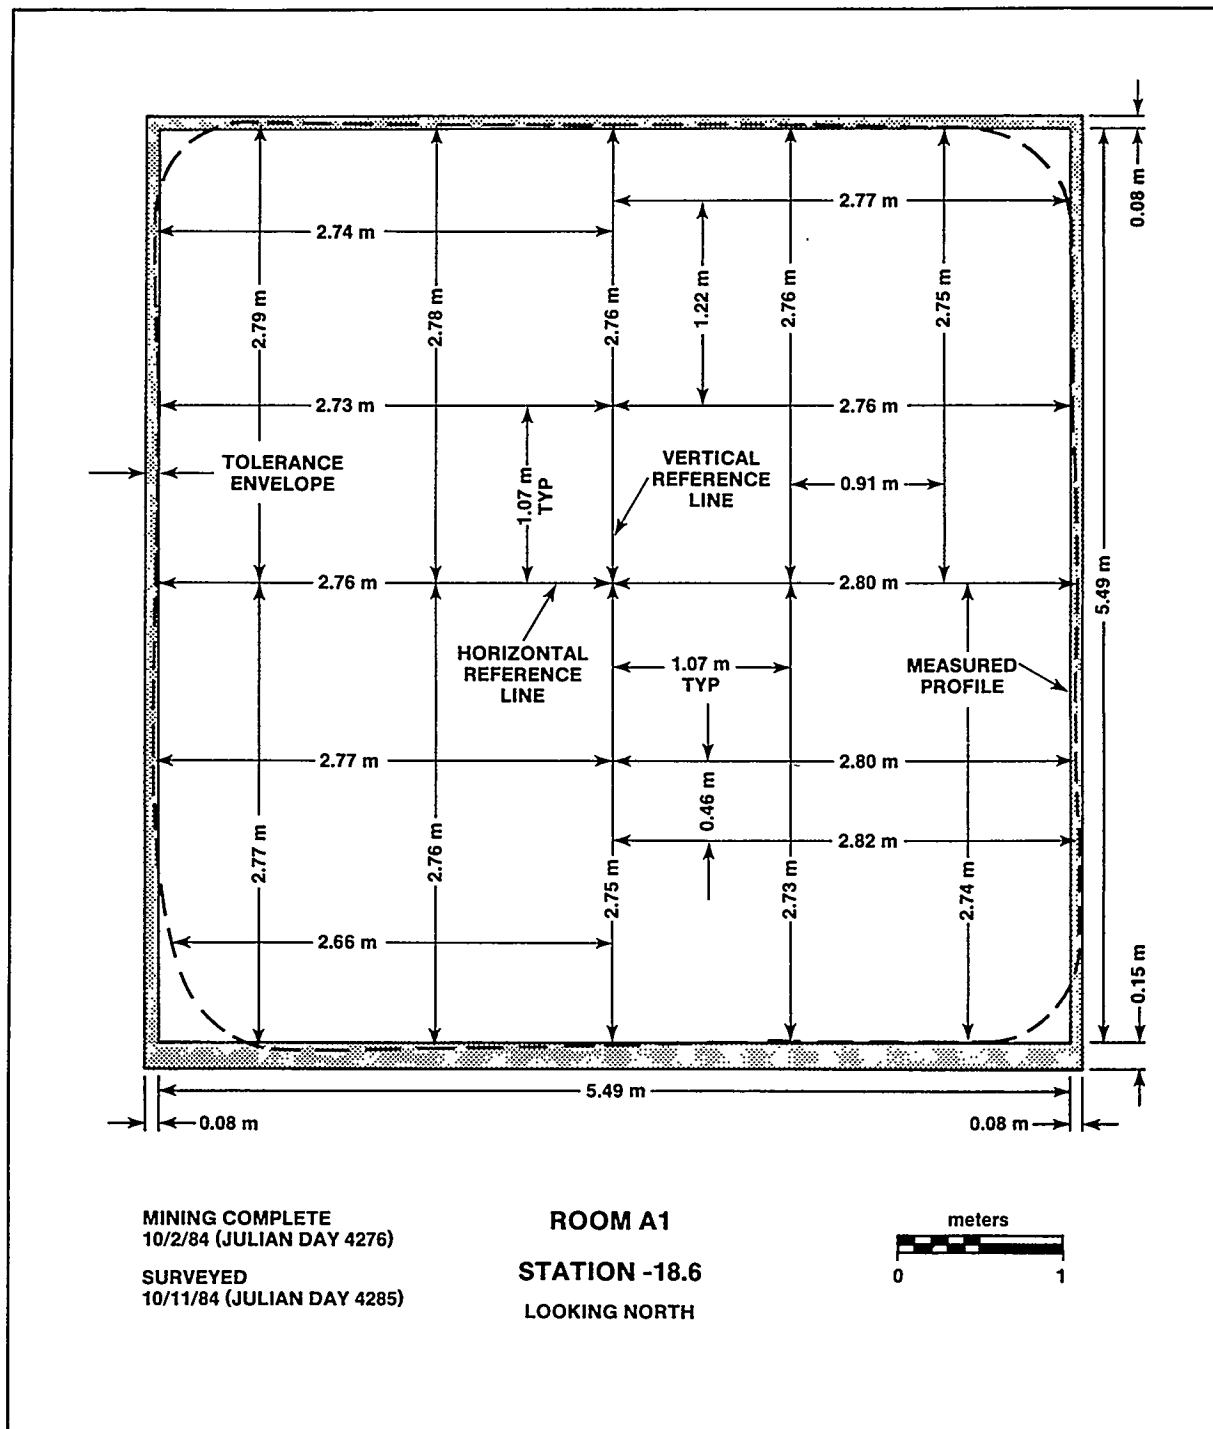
As-Built Cross Section of Station -18.6 m, Room A1
